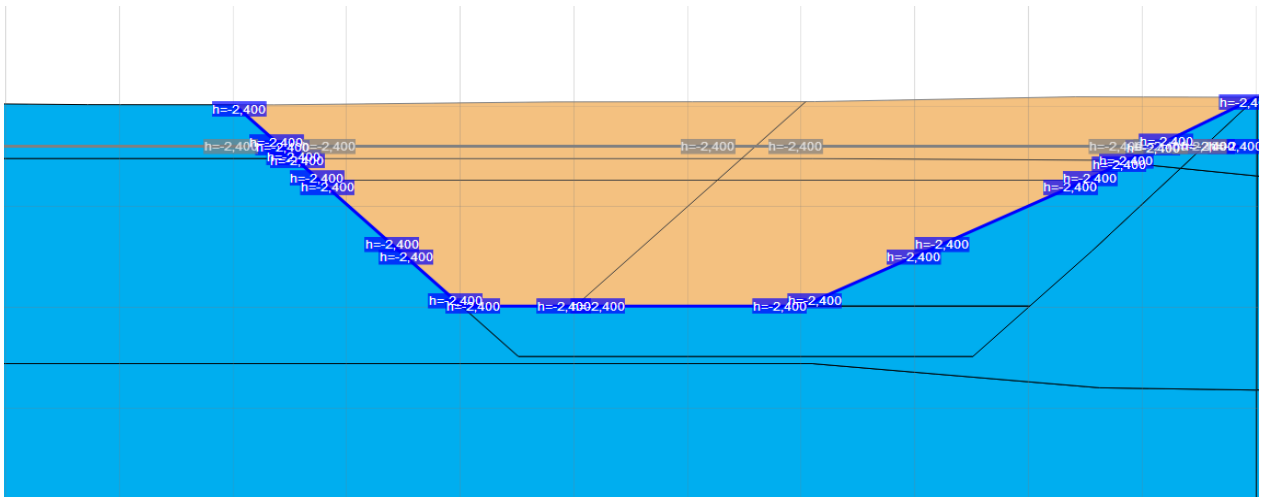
Hydraulic conditions at Excavation II (zoomed in)
